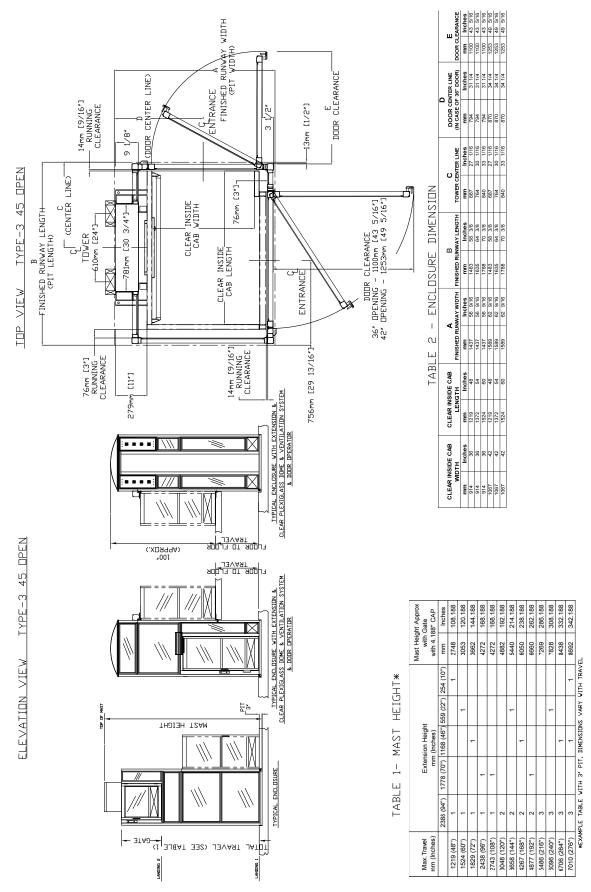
Elevation and plan view, enclosure application (Type 3, 45" opening)
